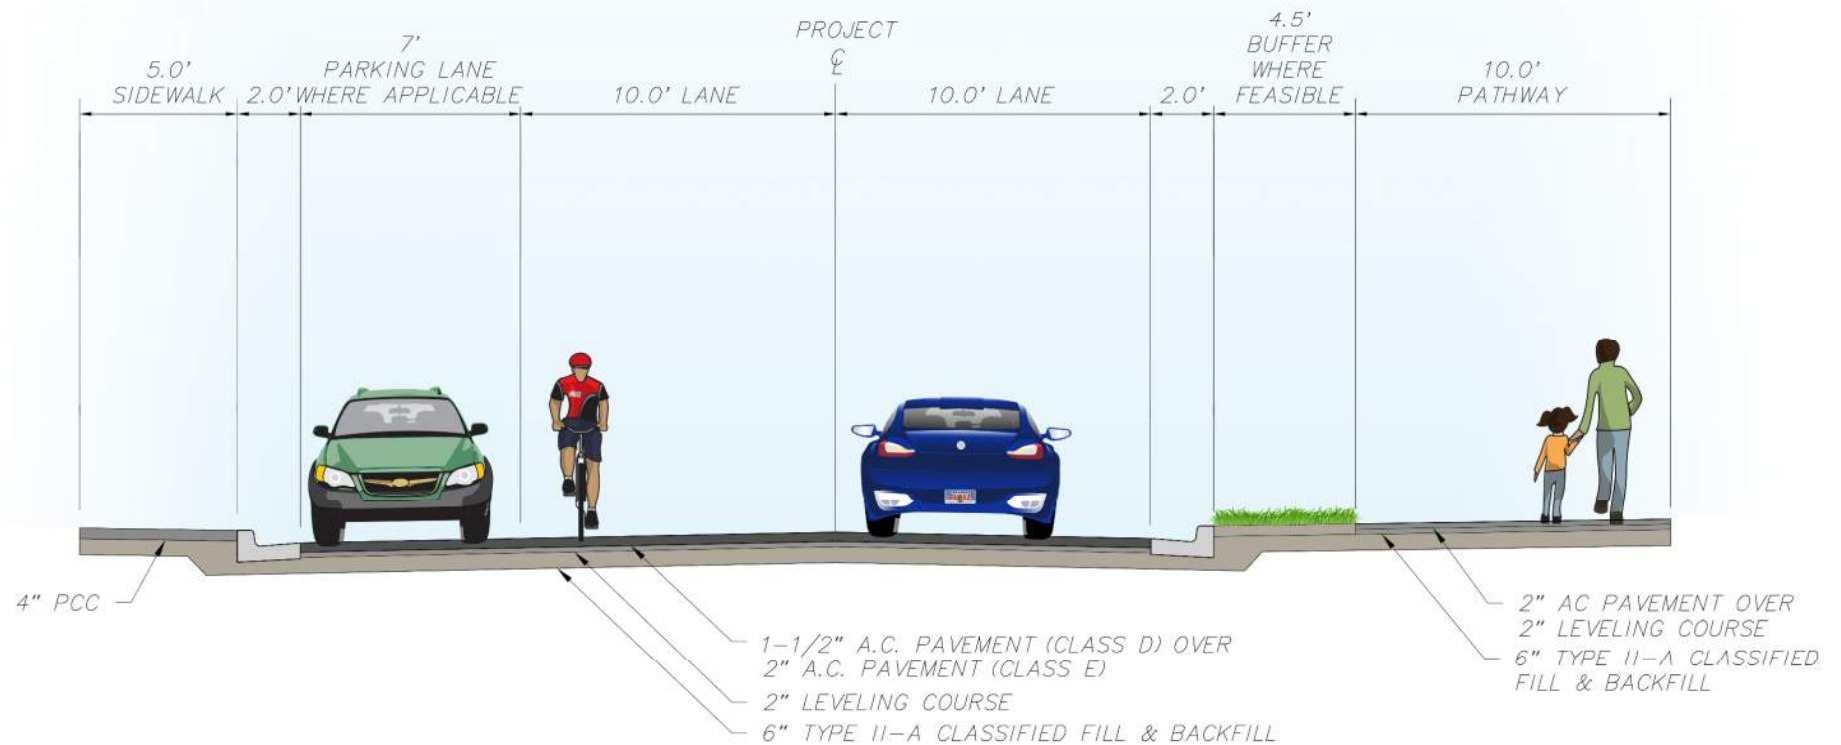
TYPICAL ROADWAY STRUCTURAL SECTION, 2ND AVENUE
